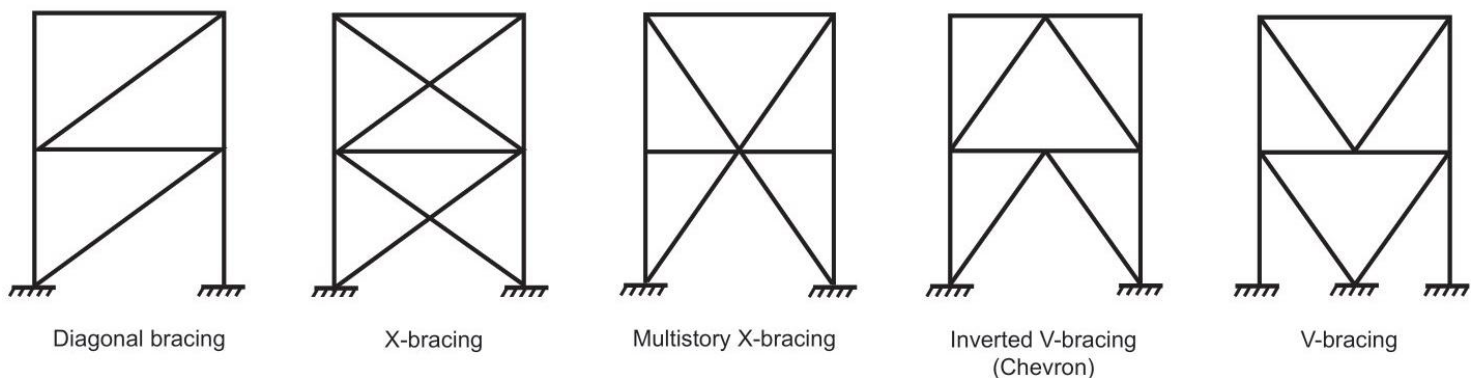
Commonly used brace layouts in concentrically braced frames (Sabelli et al., 2013)
